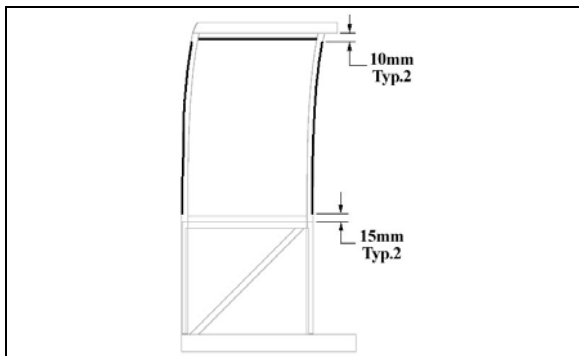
FACE FIXED WINDOWS - RUBBER SEAL INSTALLATION
